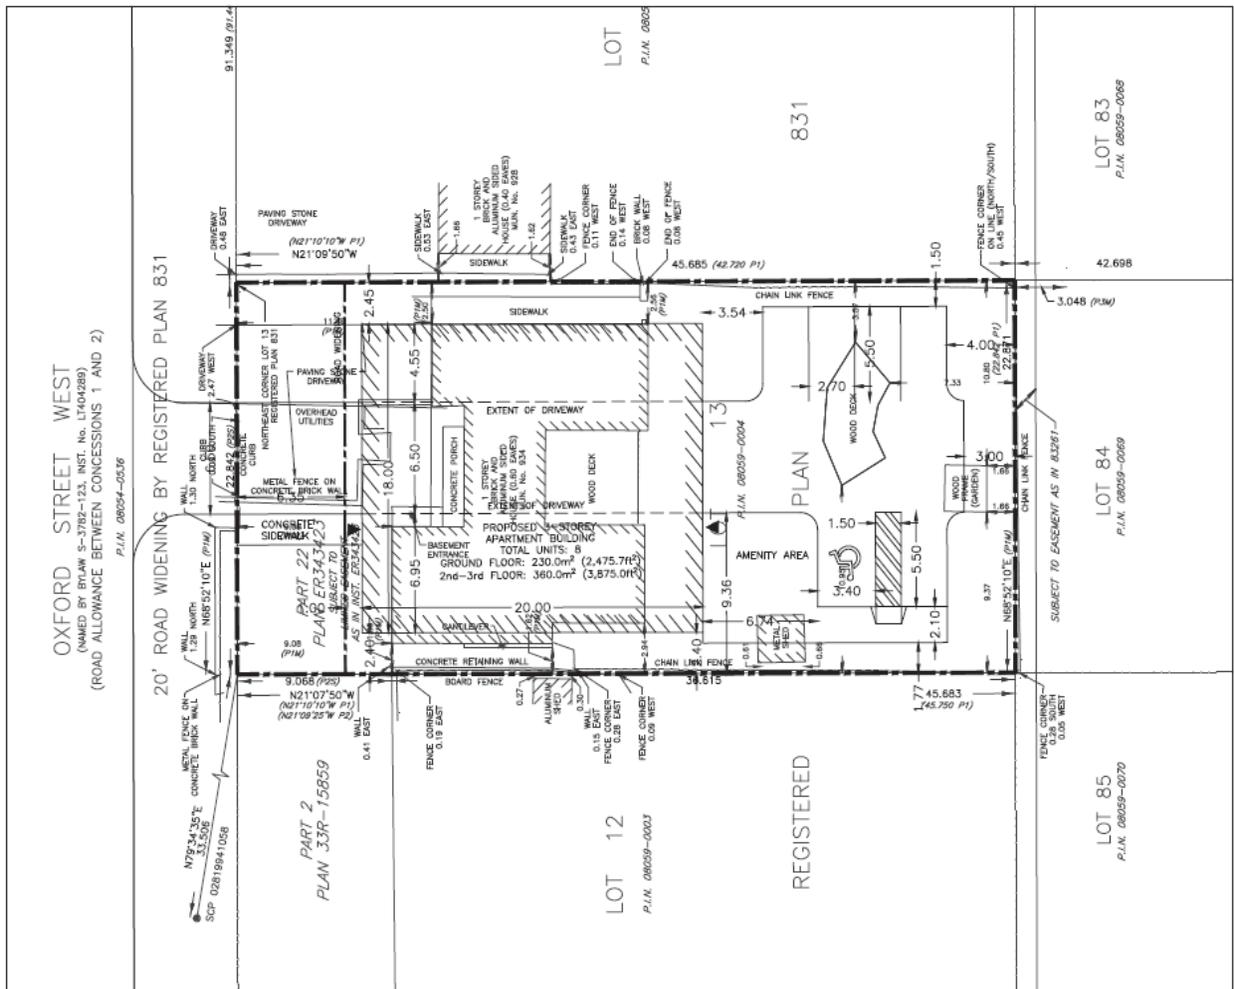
Conceptual Site Plan 934 Oxford Street West (received April 2024)
